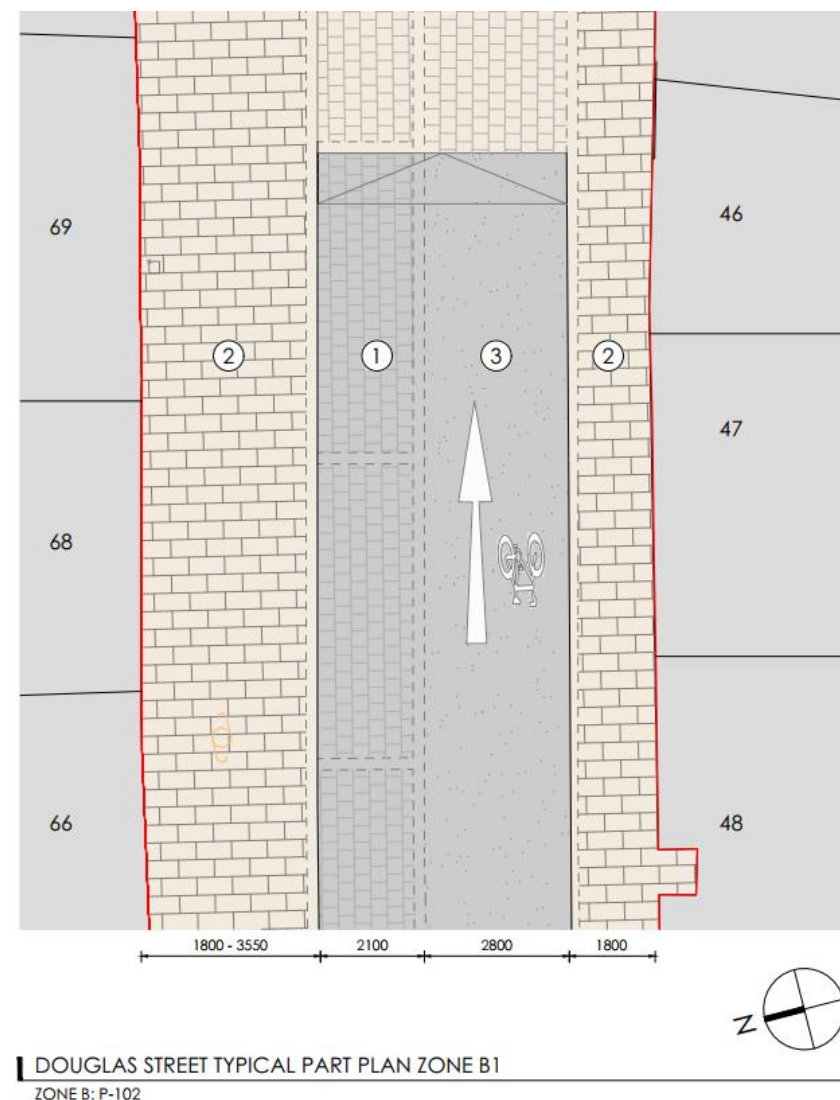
Typical Street & Footpath Widths on Douglas Street
